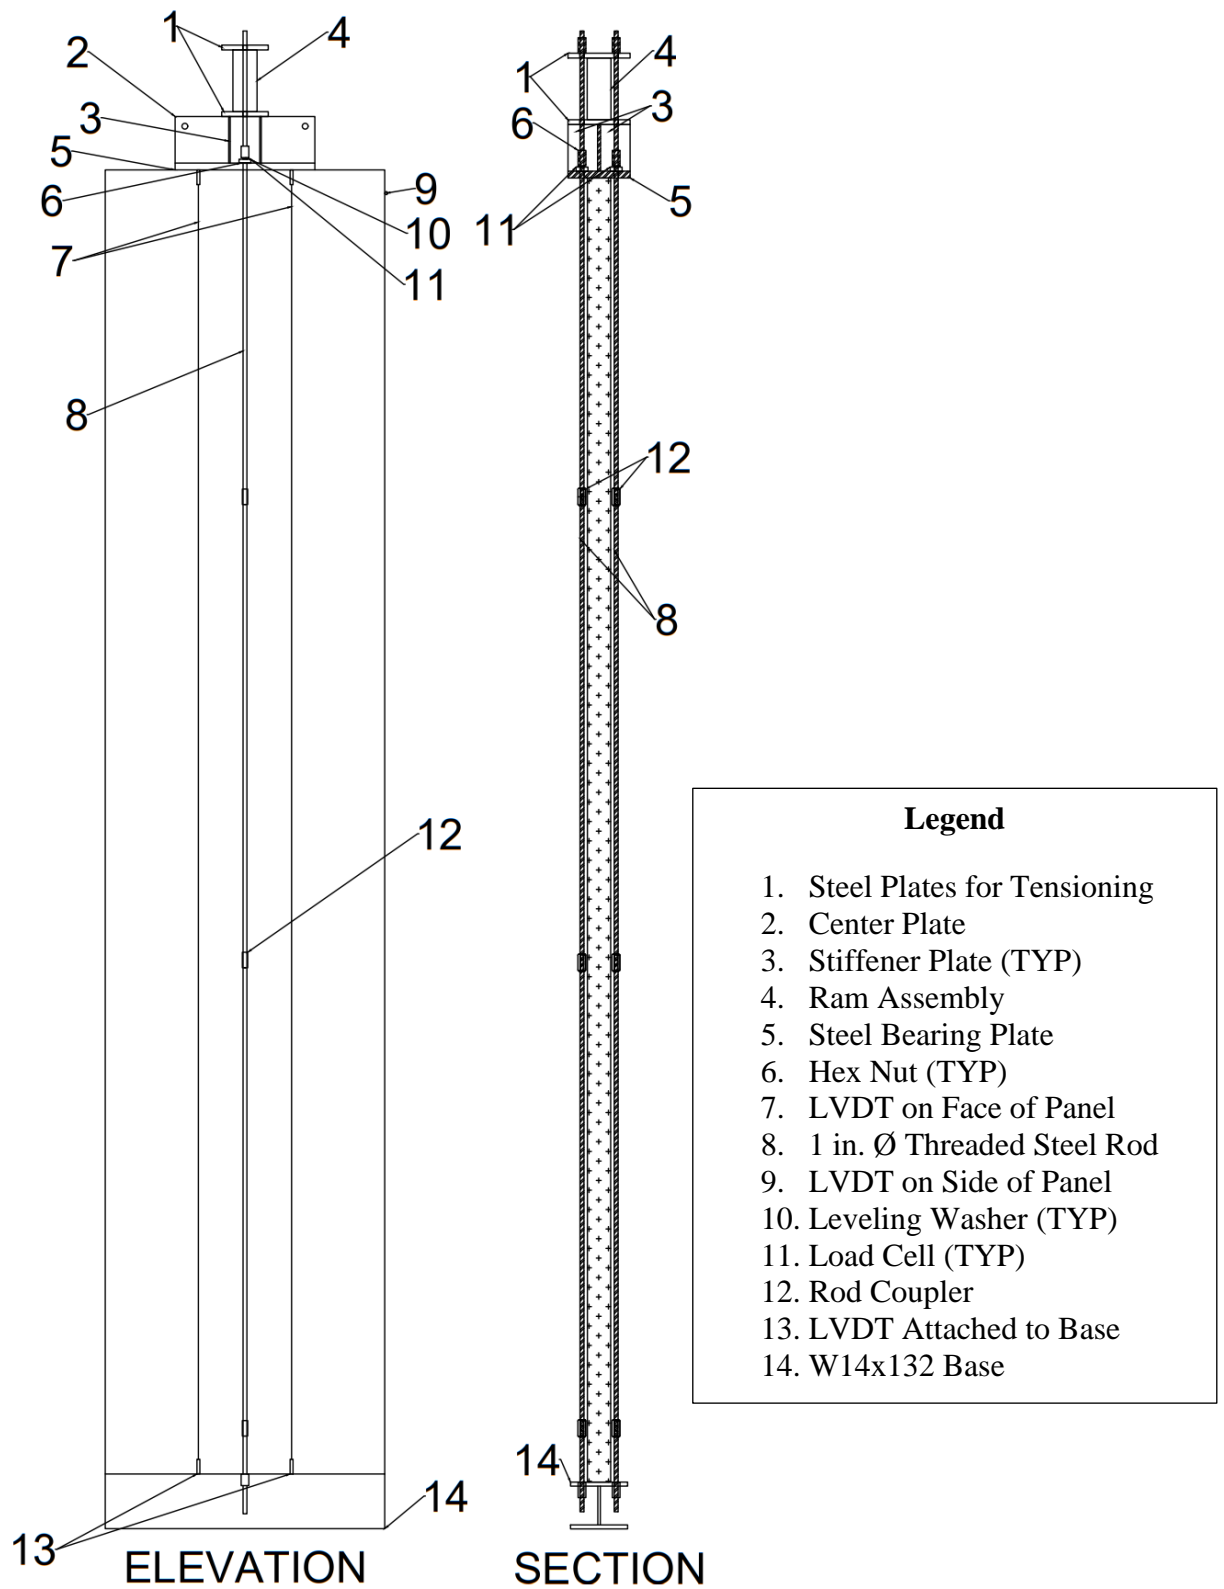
Drawings of the full-scale MPP wall with elevation and section views
